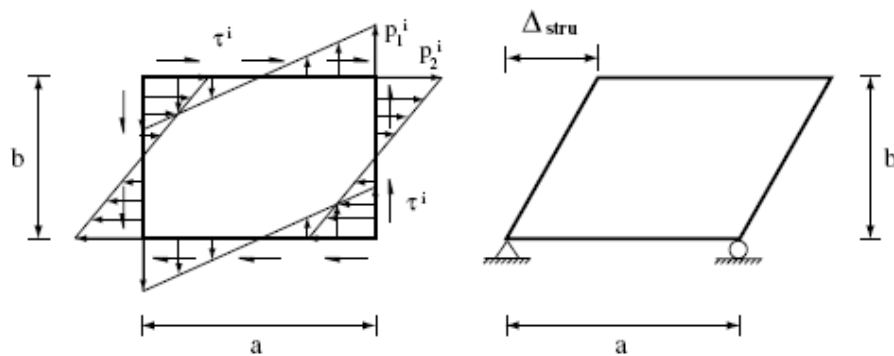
Structure loading and deformation (Huo et al., 2006)
